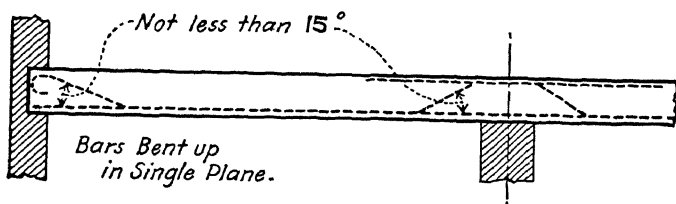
Typical Reinforced Concrete Beam; Principal Longitudinal Bars Bent Up in Single Plane.
